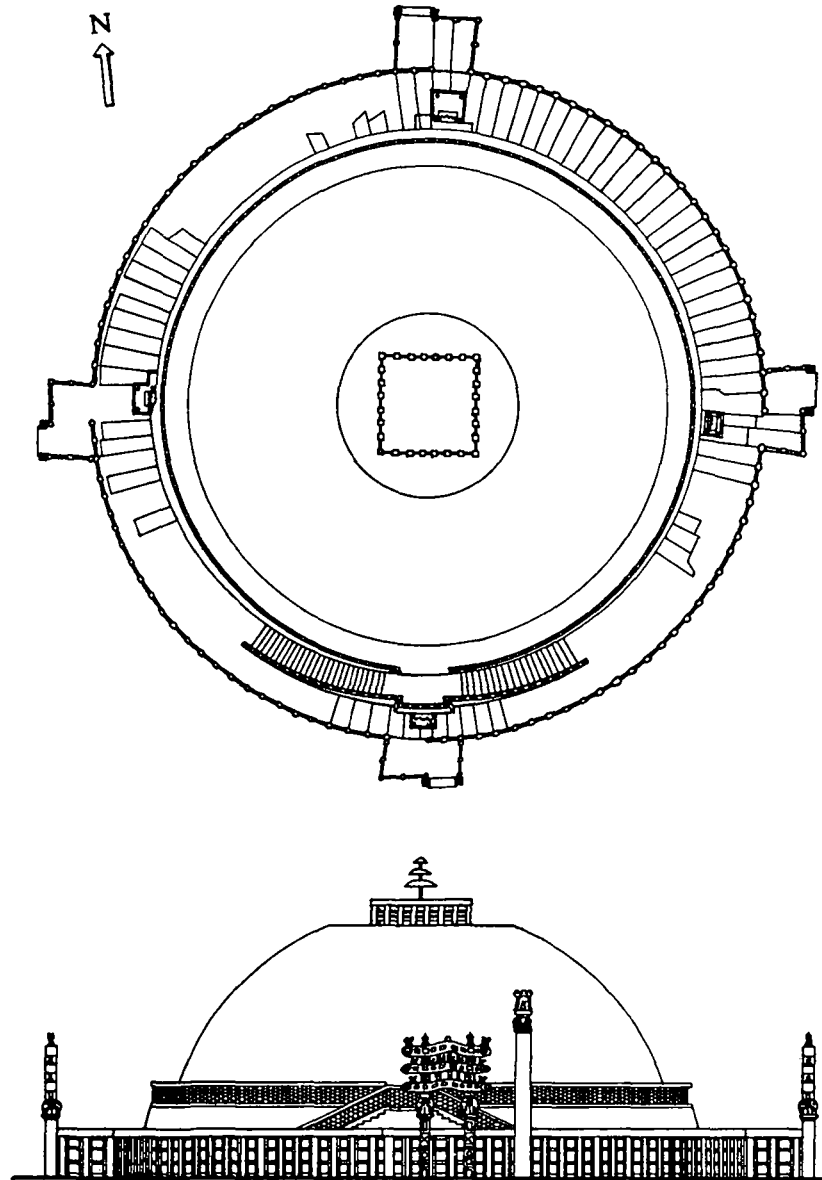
Plan and elevation of the great *stūpa* at Sāñci
